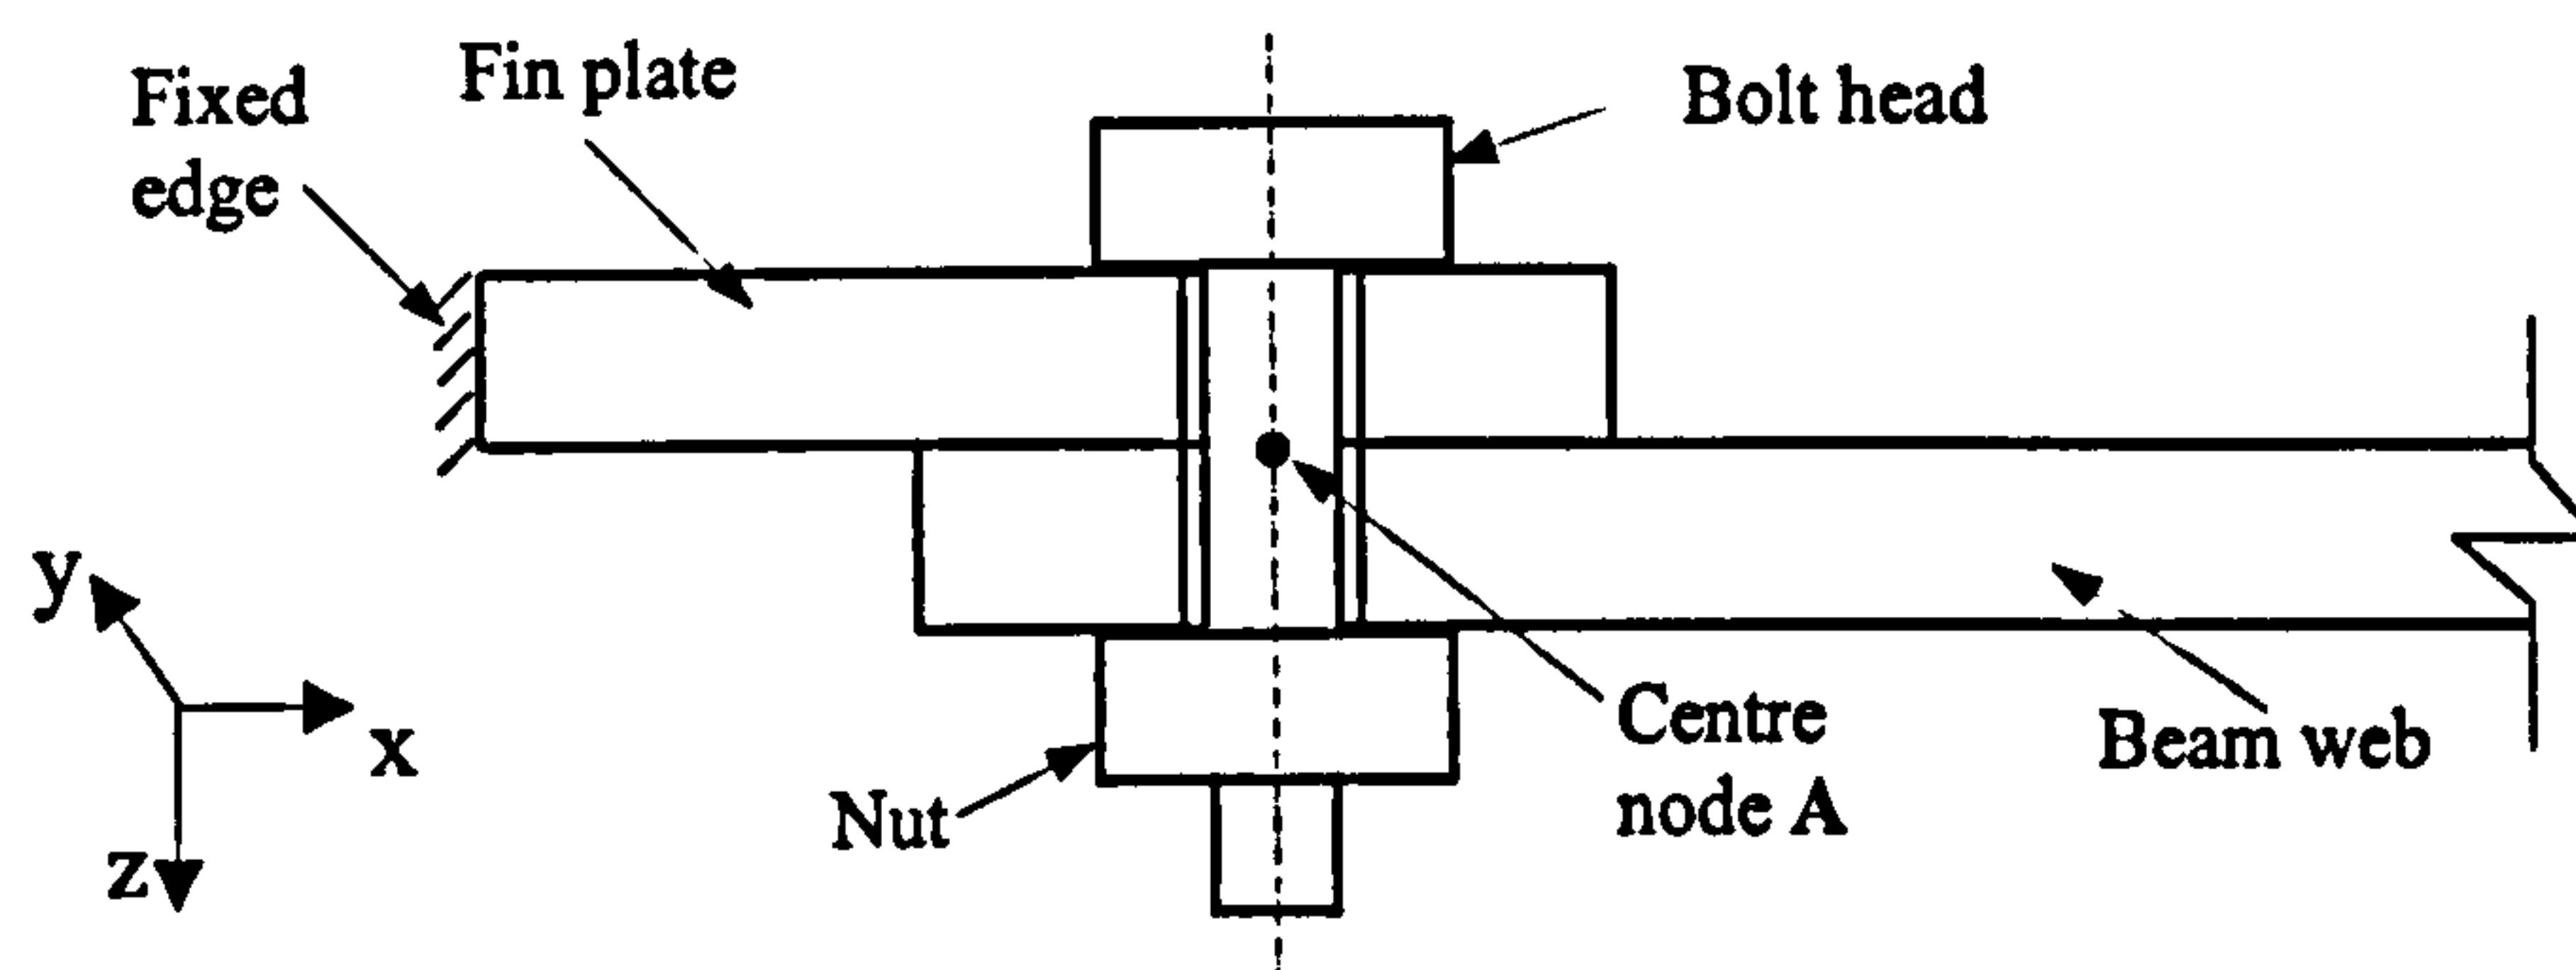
Boundary condition (Plan section on a fin plate connection)
